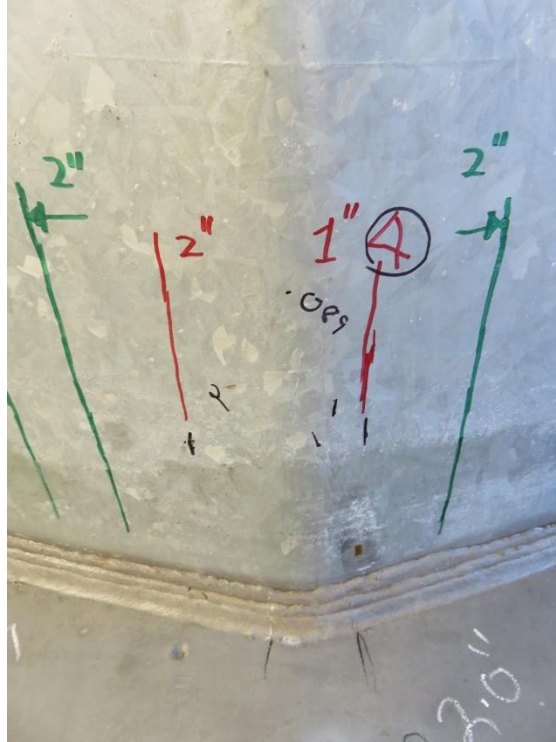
State of Cracks: Specimen 33-3-12-TX-A2 – Bend 4
